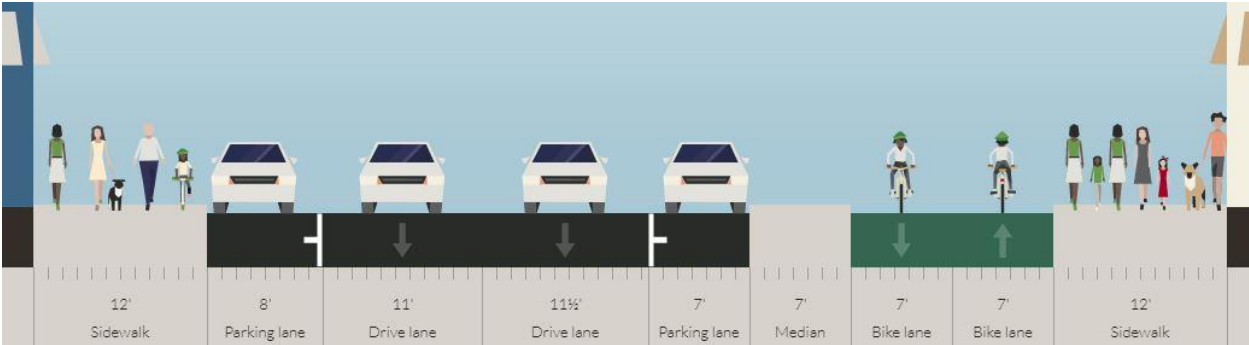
Typical Cross Section of Howard Street between 5th and between 5th and 4th streets, looking east
